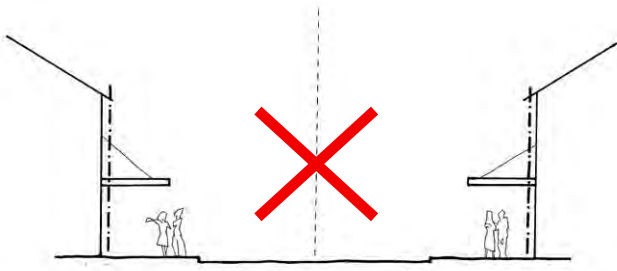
Typical street section with buildings and awnings on both verges. This is typical of the main streets in Bowral, Mittagong and Moss Vale.
